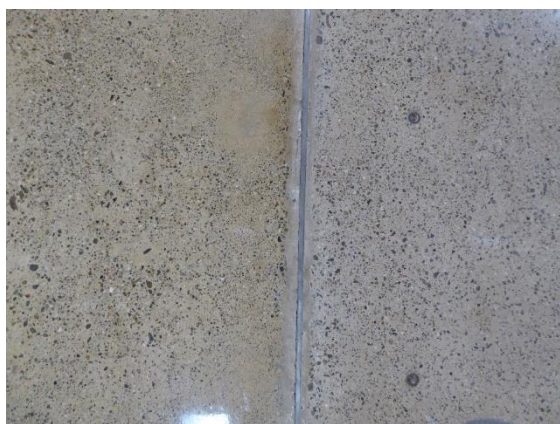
Preserved concrete floors in 380 Portage Avenue.
